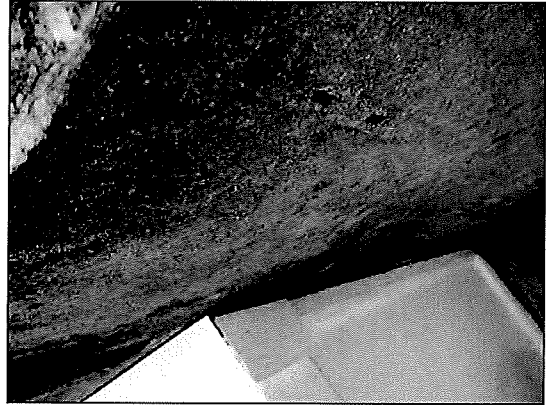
Intersection of the siding and the precast concrete roof structure is not sealed to prevent water penetration.
